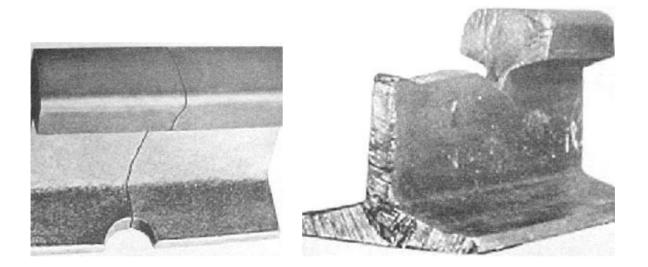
302 -DAMAGE TO RAIL BY BAD MACHINING , DRILLING OR FLAME CUTTING
